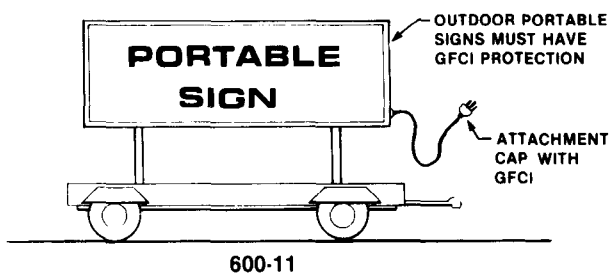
Outdoor portable signs must be GFCI protected. 600-11
